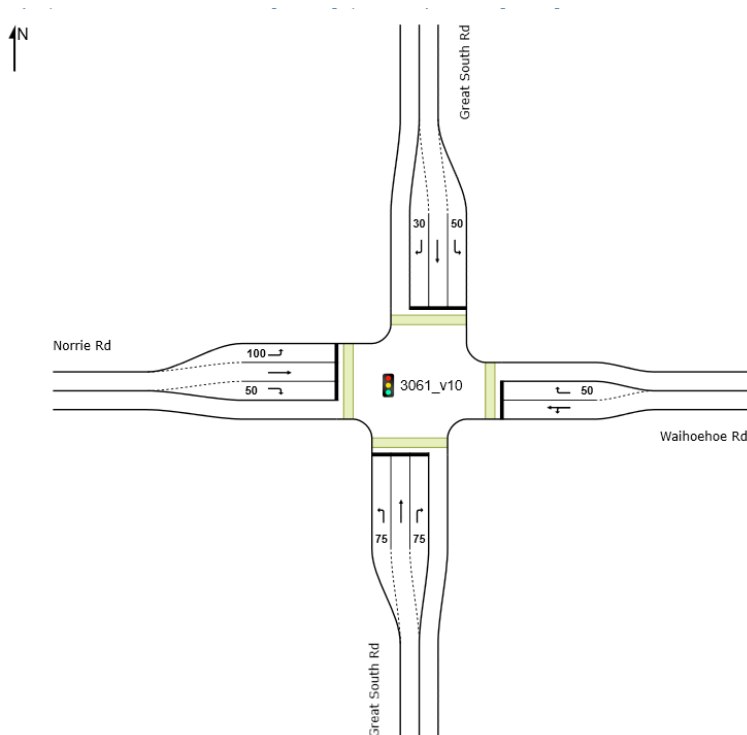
Great South Road / Waihoehoe Road SIDRA Layout, Signalised
